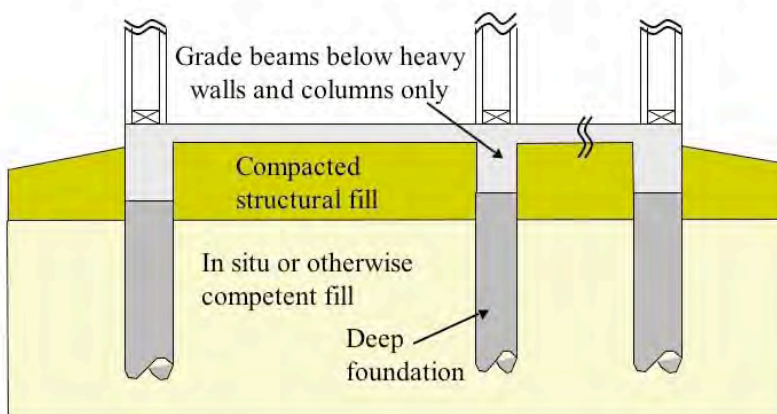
Non-Stiffened Slab-on-Grade with Deep Foundations
